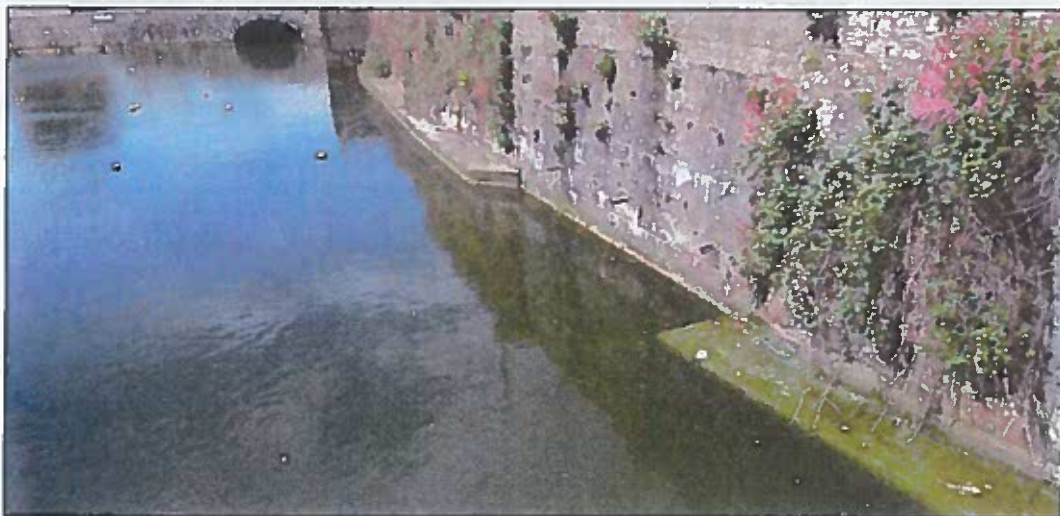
View looking southwest, highlighting the modern concrete lintel that is added to the base of the quay walls,
